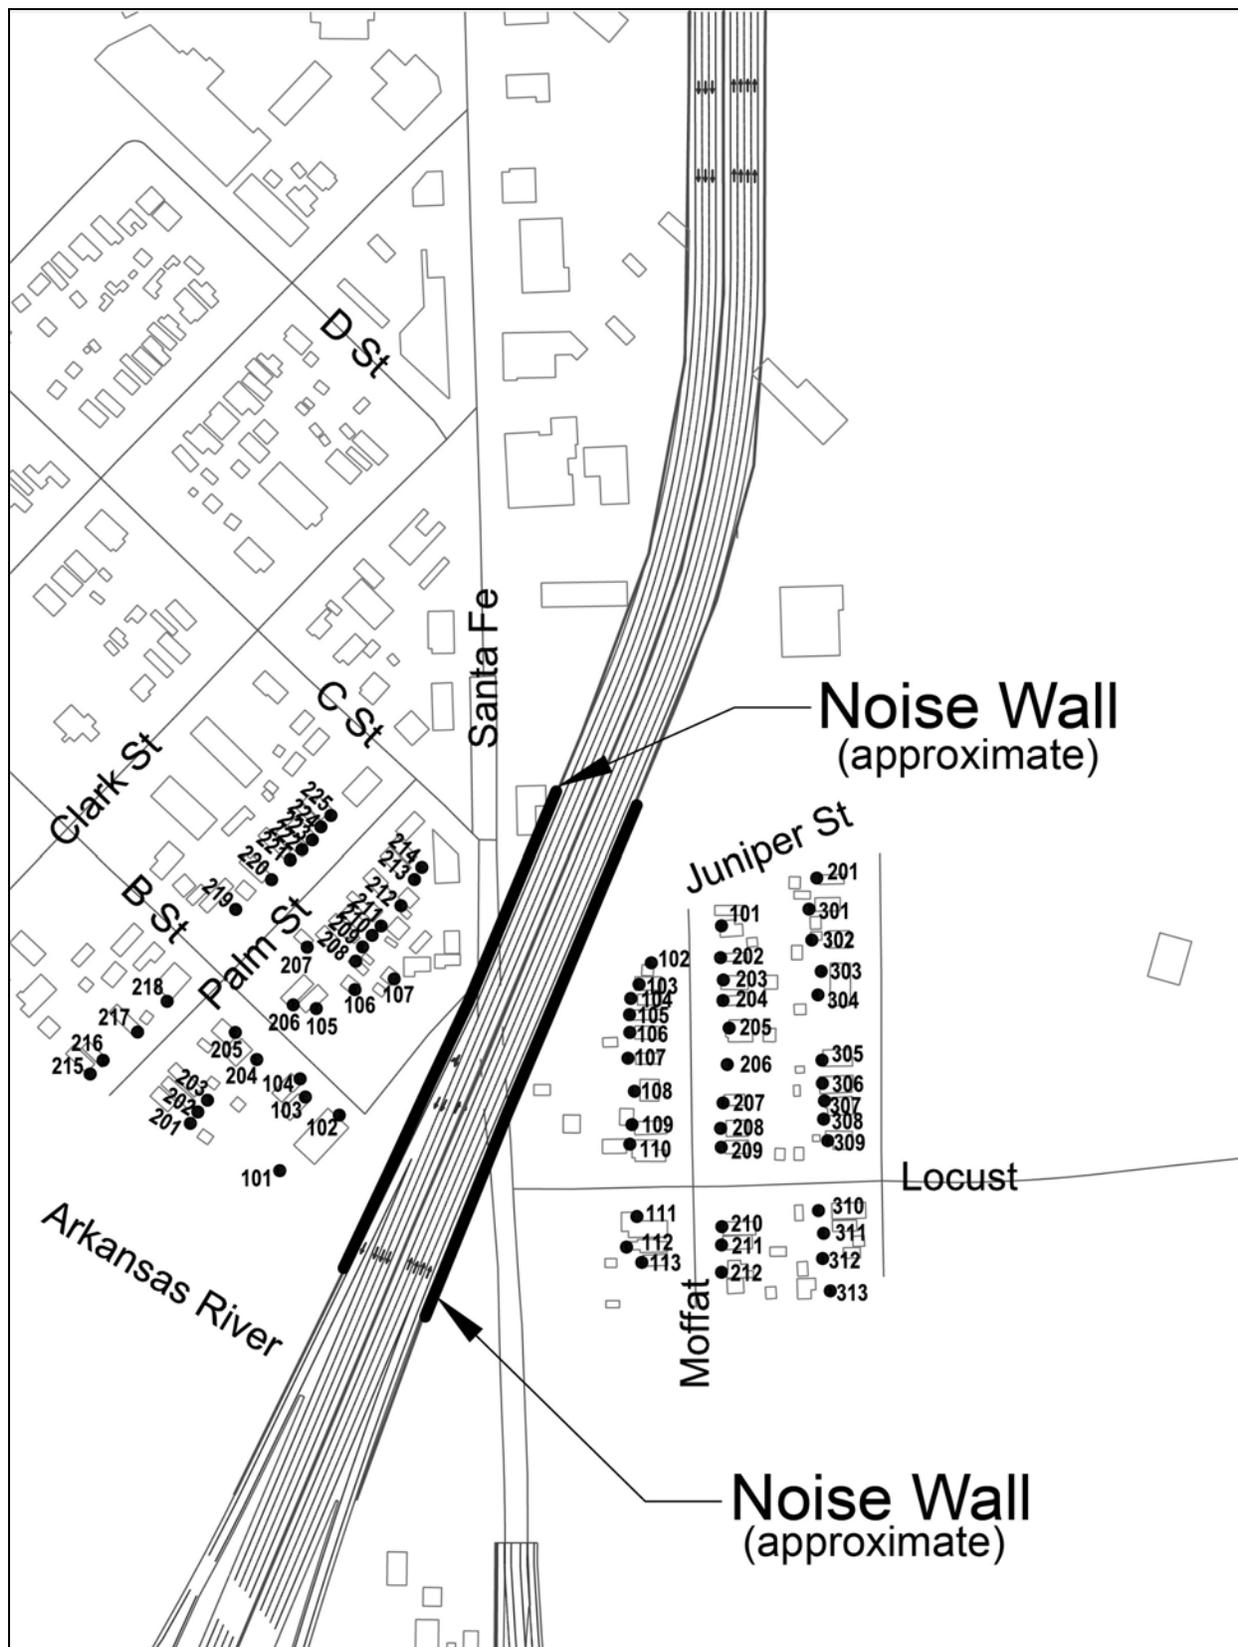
Existing I-25 Alignment Alternative – Palm Street and Moffat Street Noise Wall Analysis Locations
